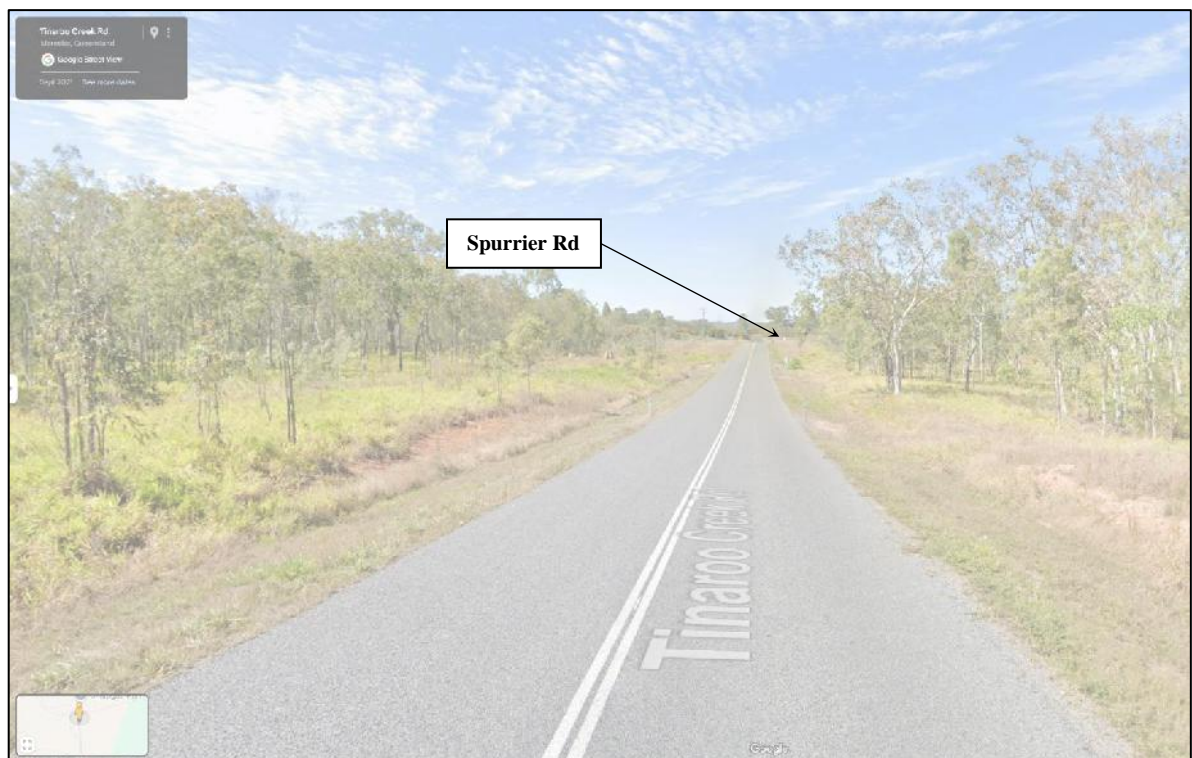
Looking South towards Spurrier Road at Tinaroo Creek Road (Source: Google Map Street View – Sept 2021)
